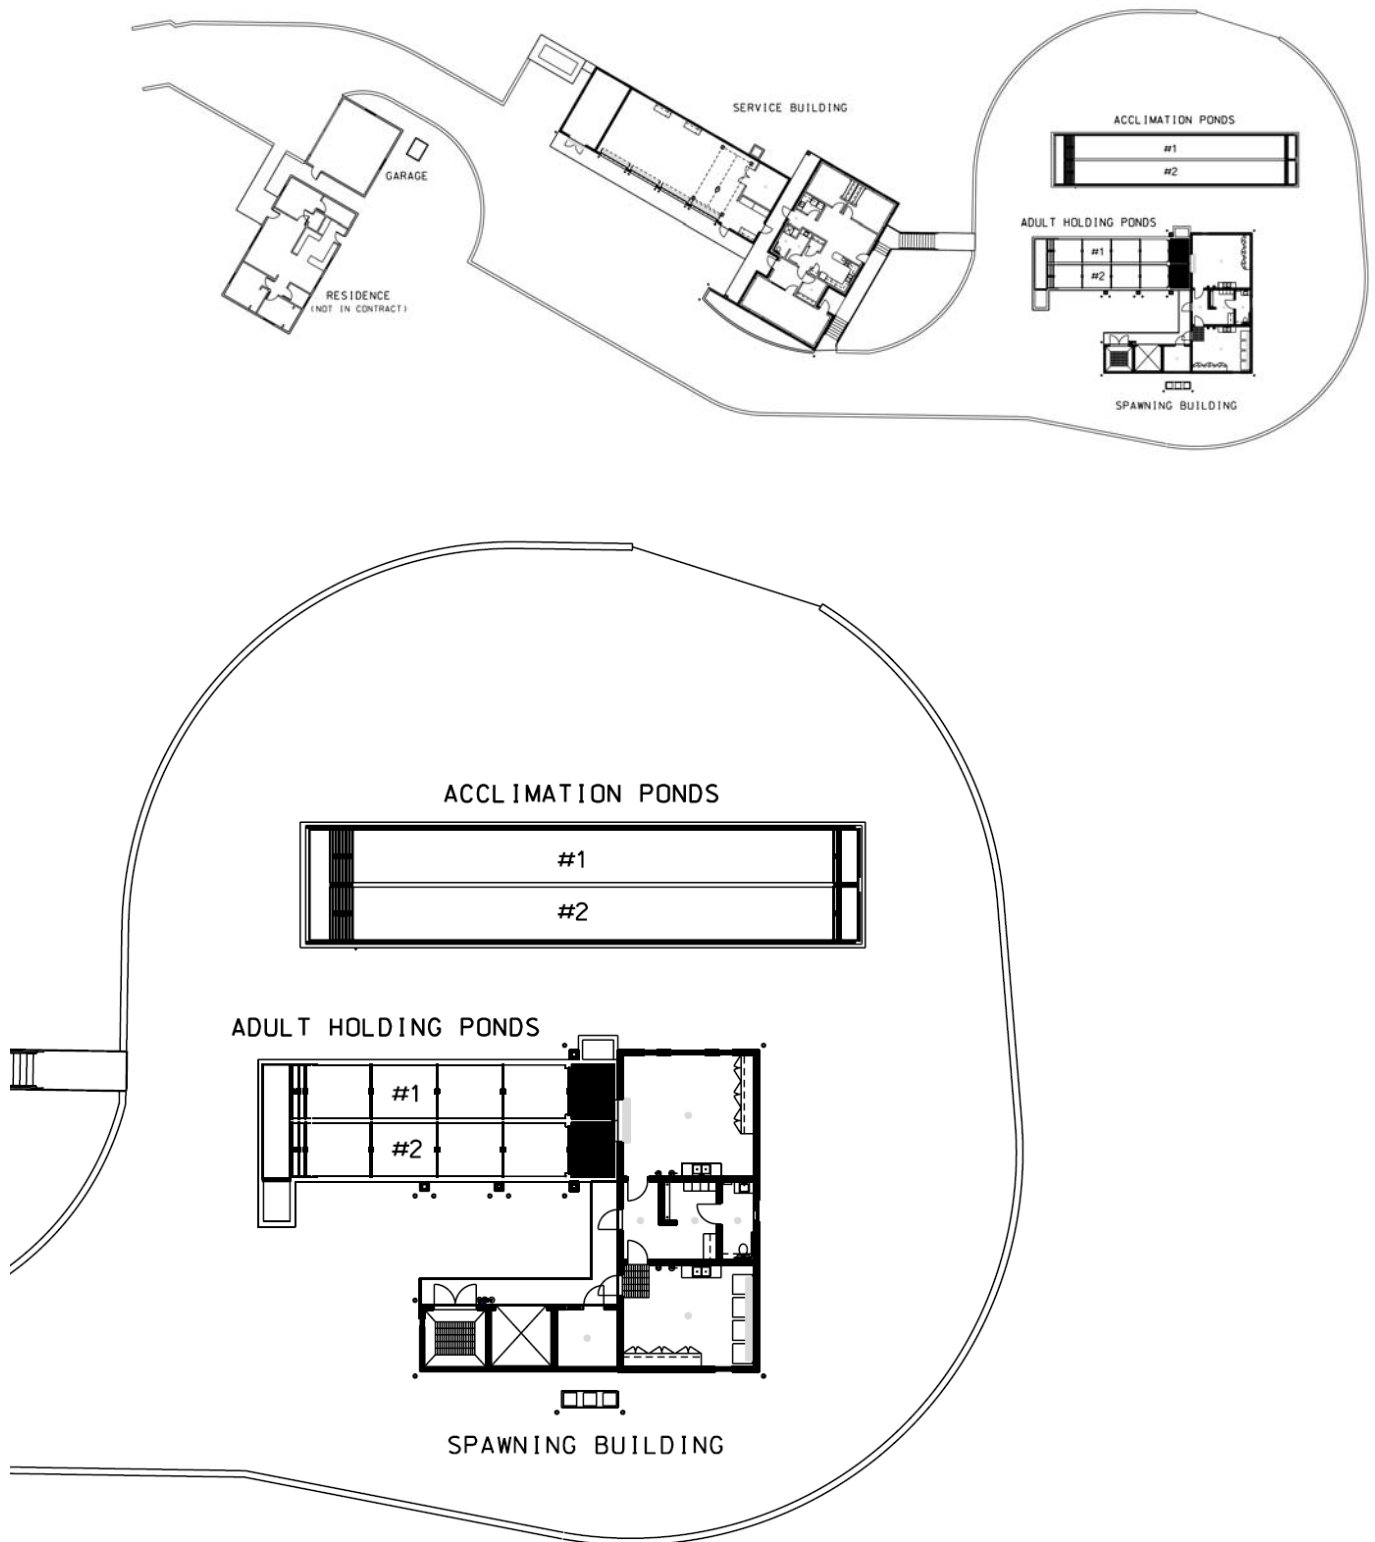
Site Plan for the Existing Parkdale Fish Facility with Enlarged Detail of the Spawning Building, Adult Holding and Acclimation Facilities
